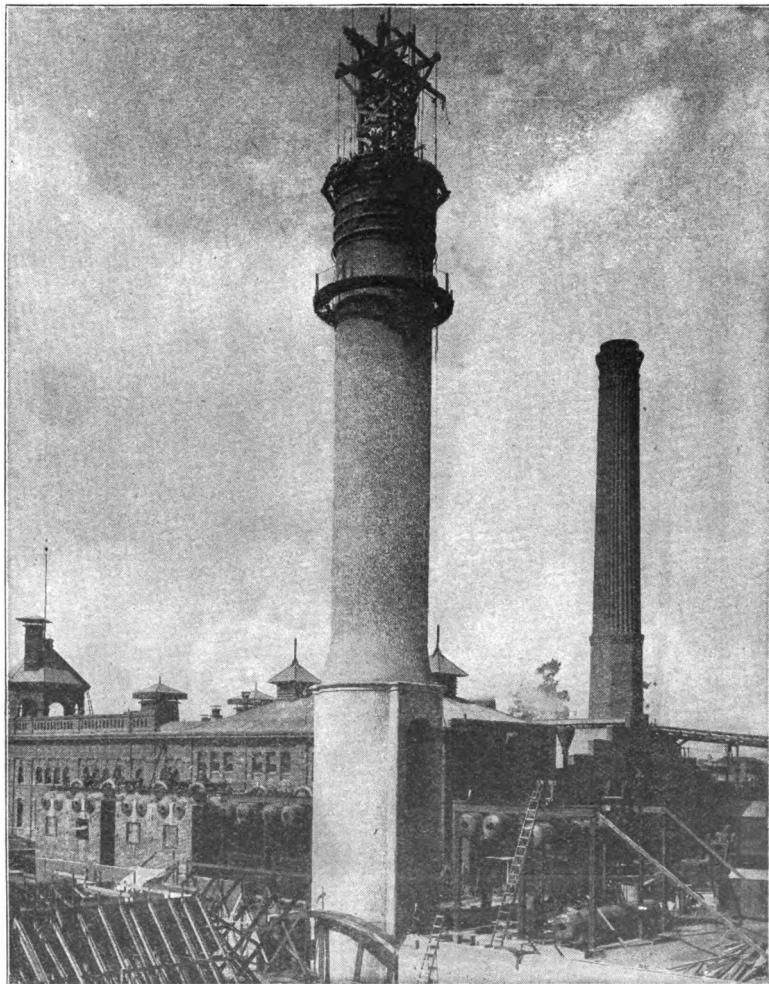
The Tallest Concrete Chimney in the United States (in Process of Construction), the Pacific Electric Railway, Los Angeles, Cal.
